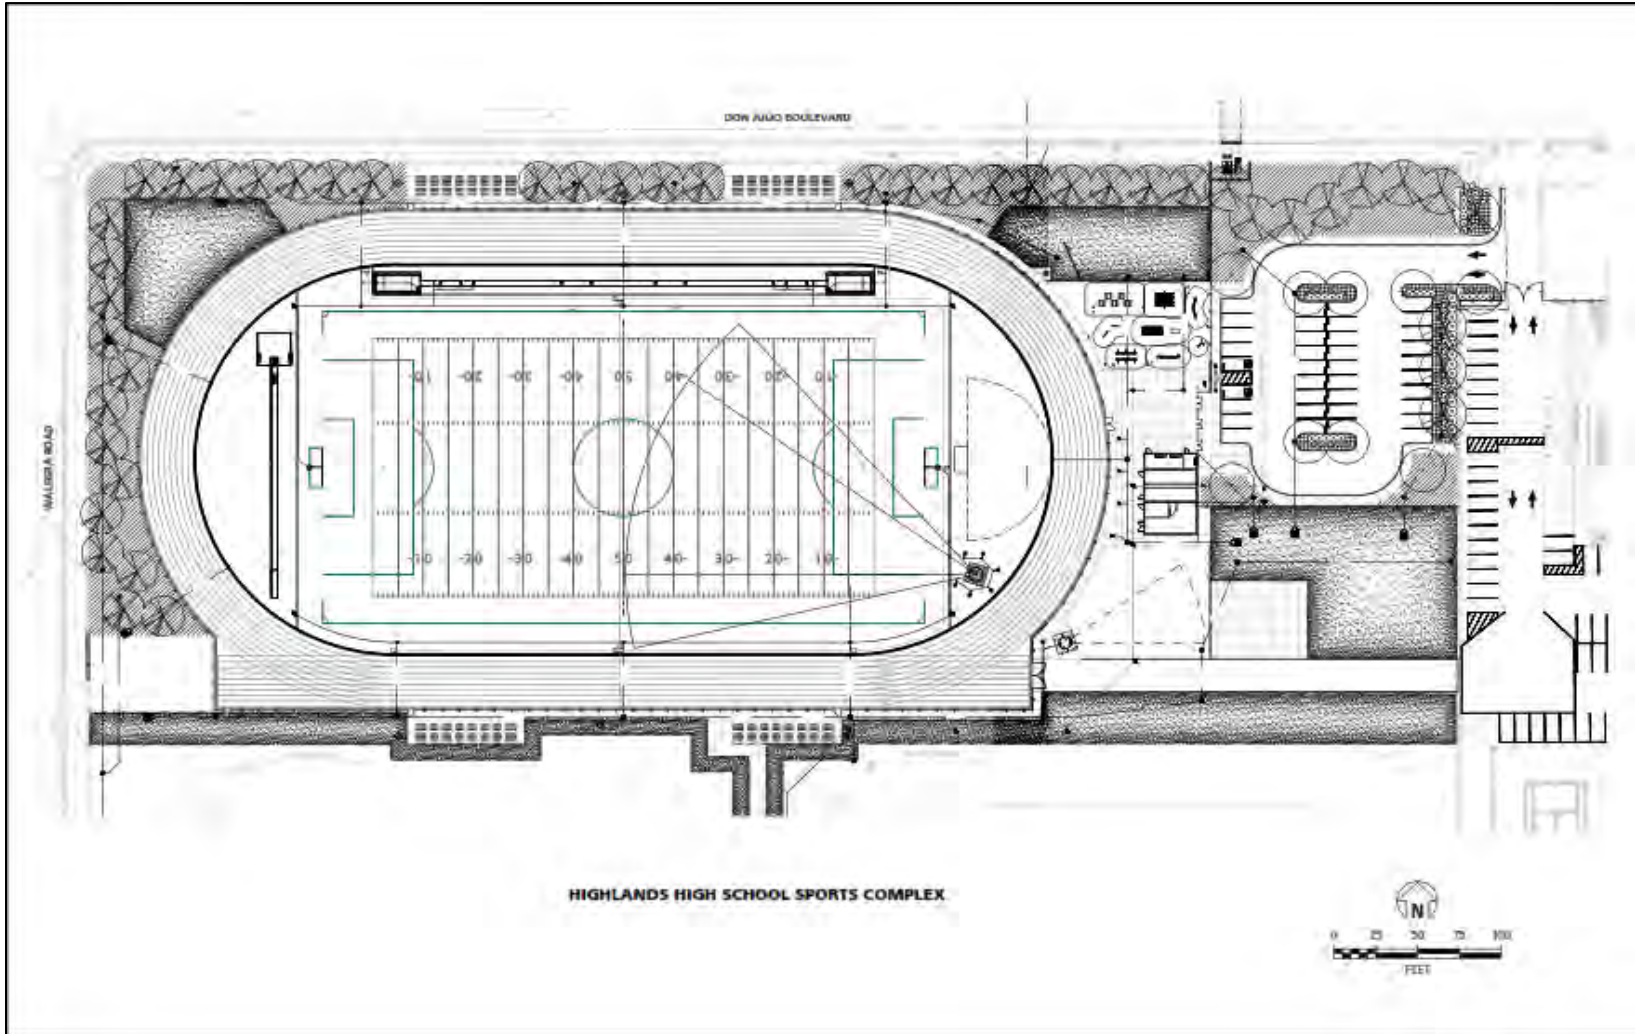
Project Site Plan – Grassetti Environmental and PBK Architects, Inc.
